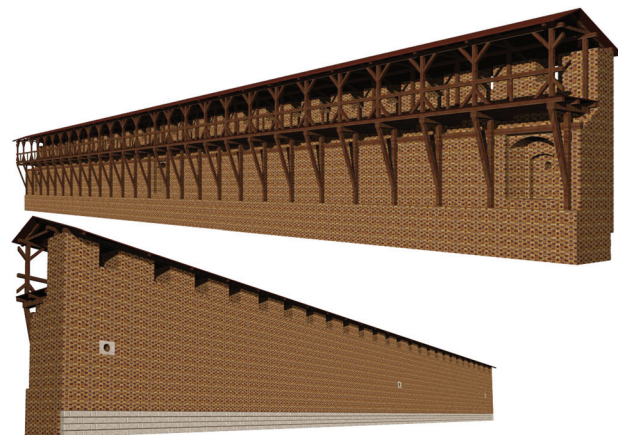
Sections and views of the stage I wall under reconstruction (drawn by the authors)
